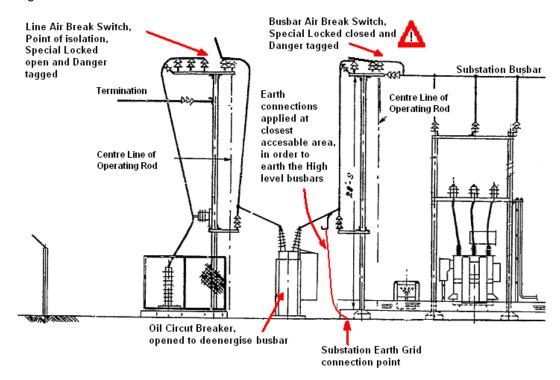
Typical arrangement for earthing high level bus bars in a substation
